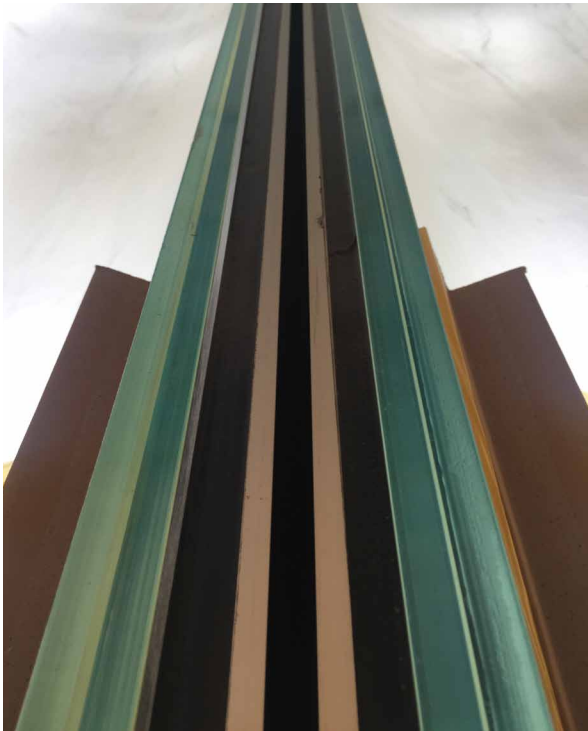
Detail of two half tubes after installation. The glass is protected with an adhesive film
